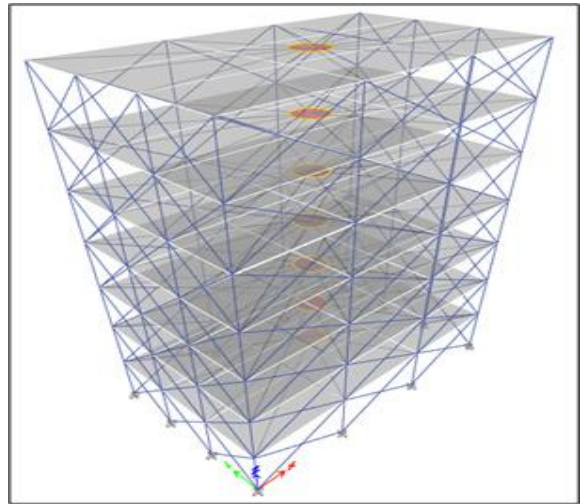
Shows In-Filled Frame Single Strut Approach from 1st Story (Model-2).
